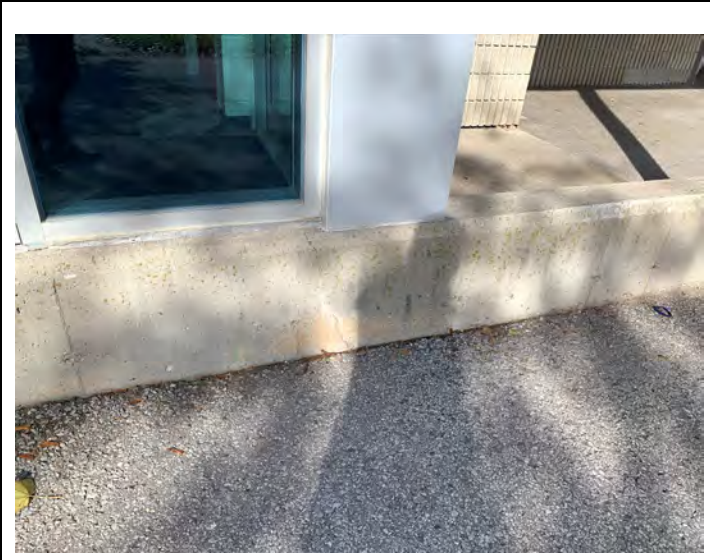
West Elevation Foundation Wall Minor Cracking
